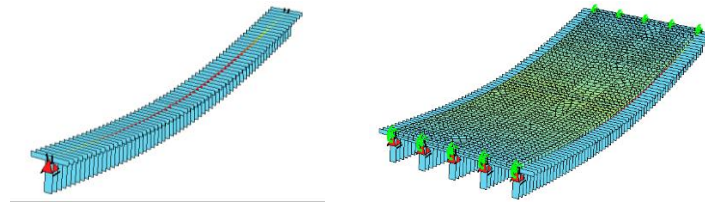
Model for finite element analysis (girder modelled with beam elements and T cross section – left; deck modelled with plate elements, connected with beam elements in their centre of gravity).
